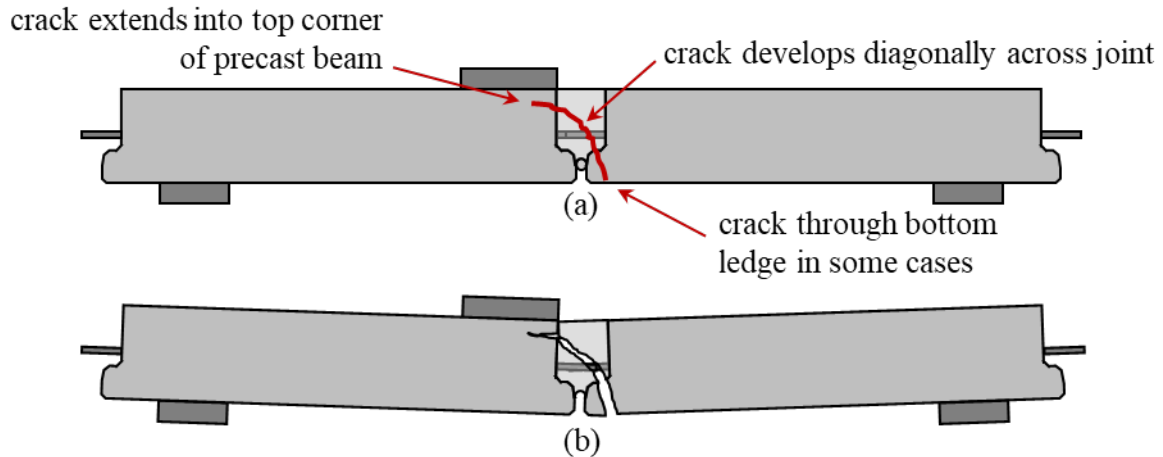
First typical failure pattern in 12-inch specimens: (a) cracking at failure and (b) after failure (12F1 is shown)
